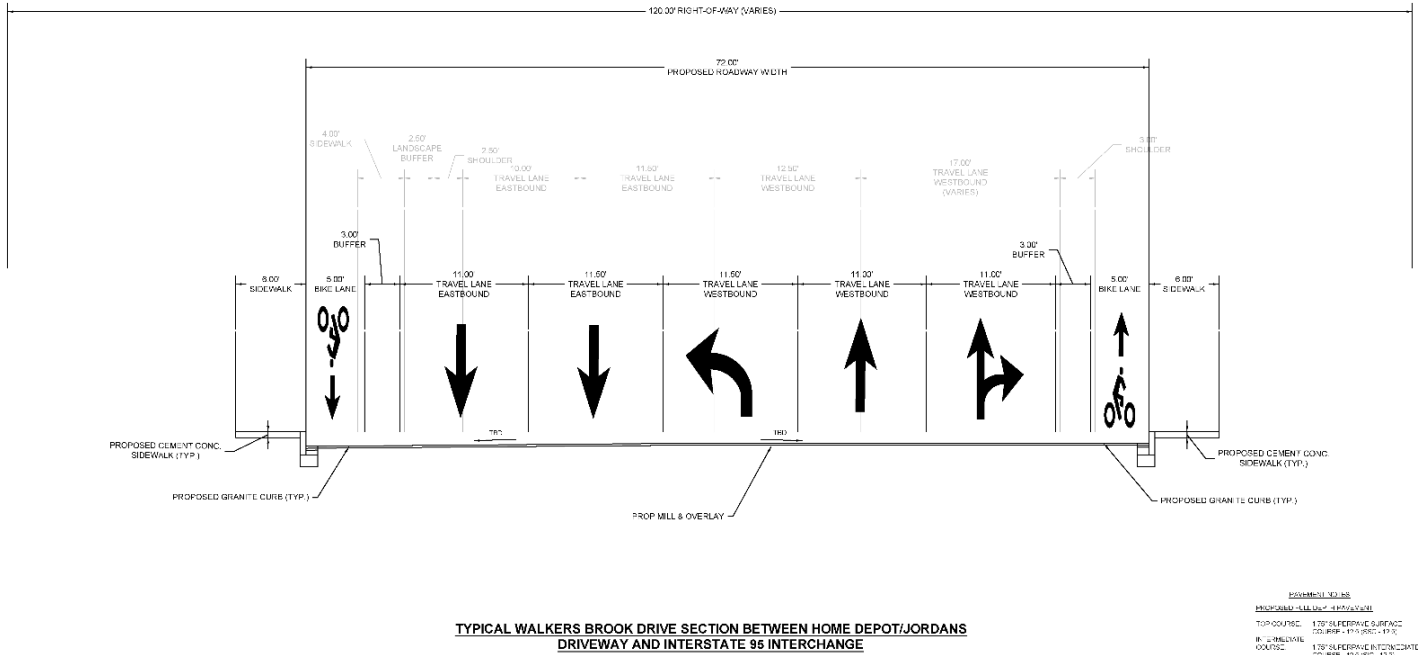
Alternative 1 (on-road buffered bicycle lanes) – Typical Section 2
